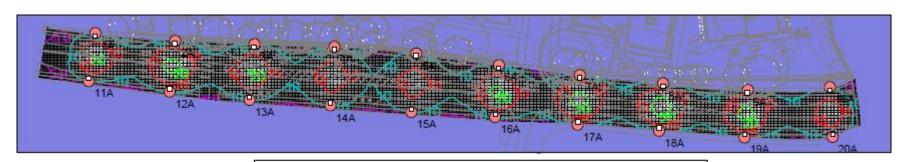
Scholarstown Road Main Road Public Lighting
